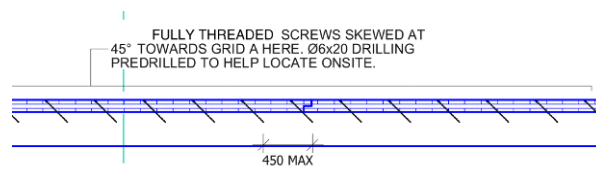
Connection of Floor Panel to Band Beam (Image credit: XLam Australia)
